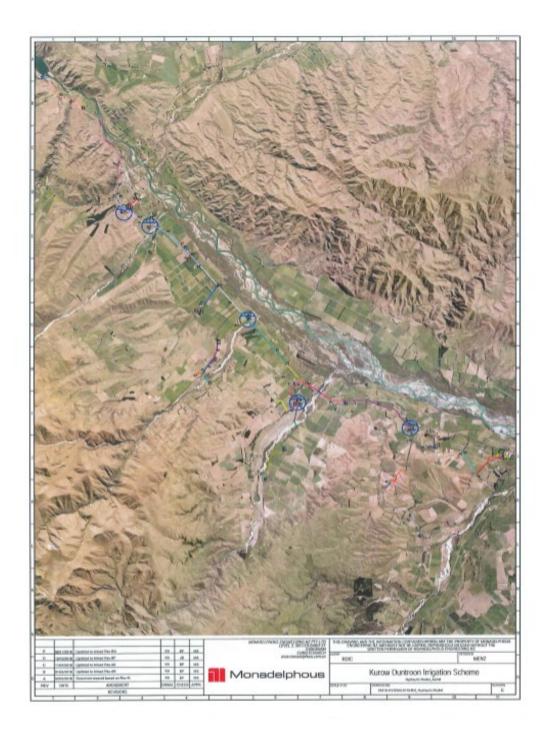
Kurow- Duntroon area with pumphouse locations (source, application for changes Feb 2019)
